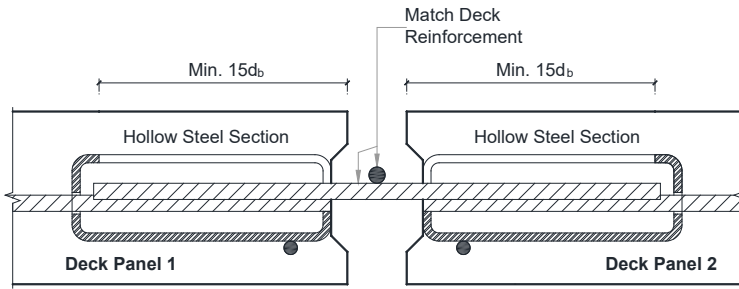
Female-to-female Transverse Joint Detailing for Fully Precast Bridge
